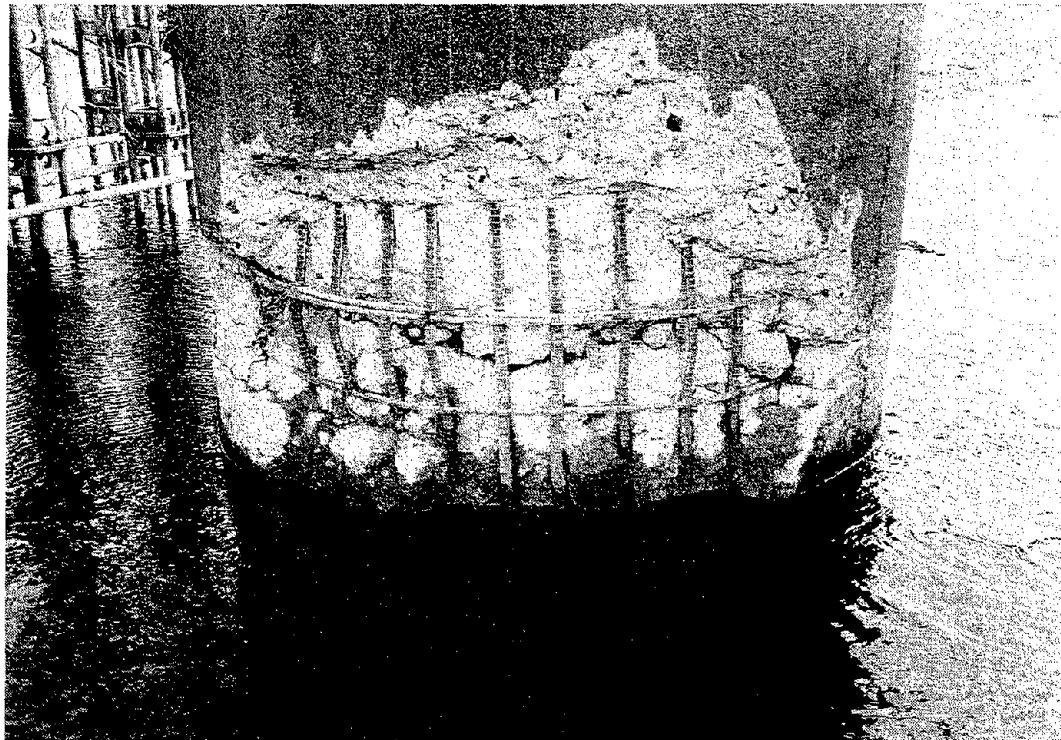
Damage of Pier P3 (from the lower stream side)
